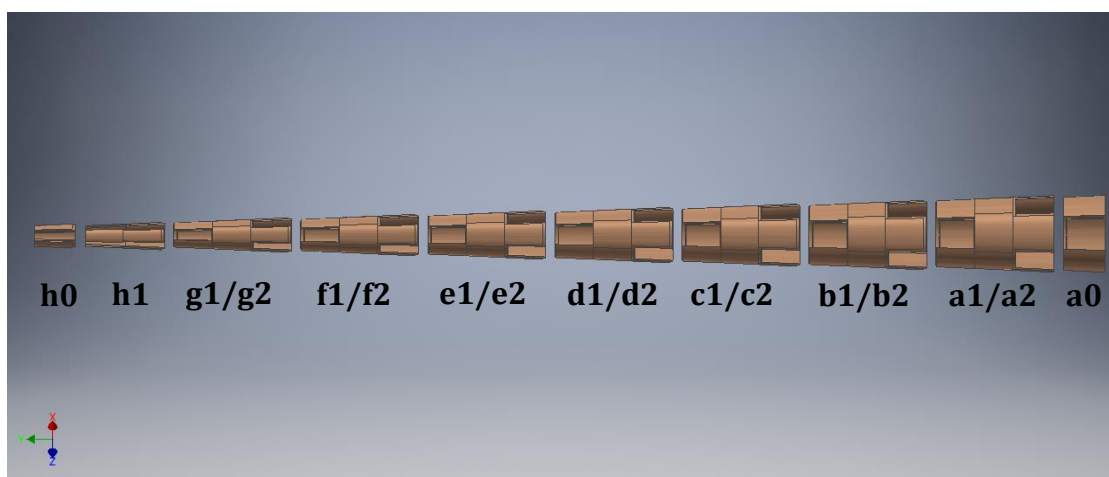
Assembly process of the 120 m tower built out of 51 modules.
